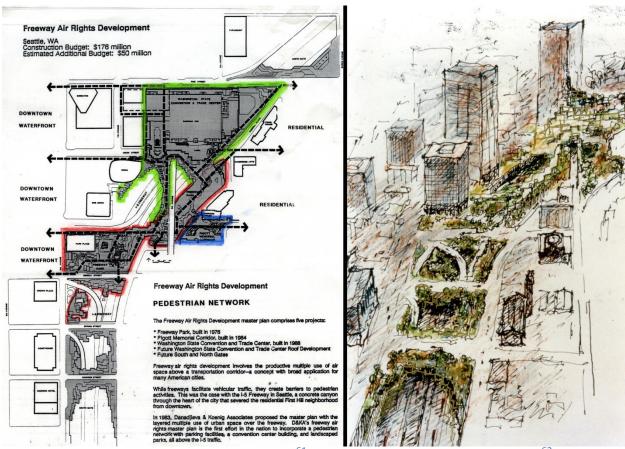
Left: air rights site plan. 61 Right: sketch by Angela Danadjieva. 62
